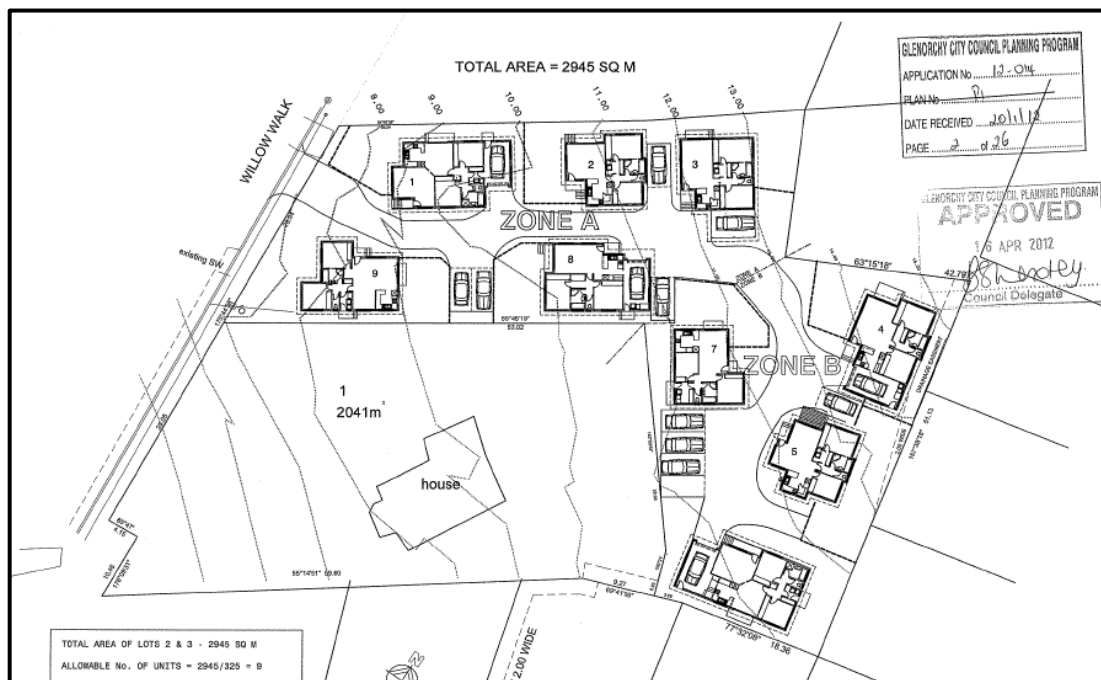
Site Plan for 3 Willow Walk, Austins Ferry.
